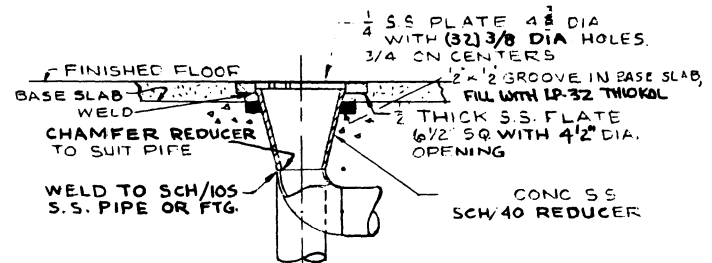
Containment air seal details of piping penetrations, details "B", "C", and "D".
